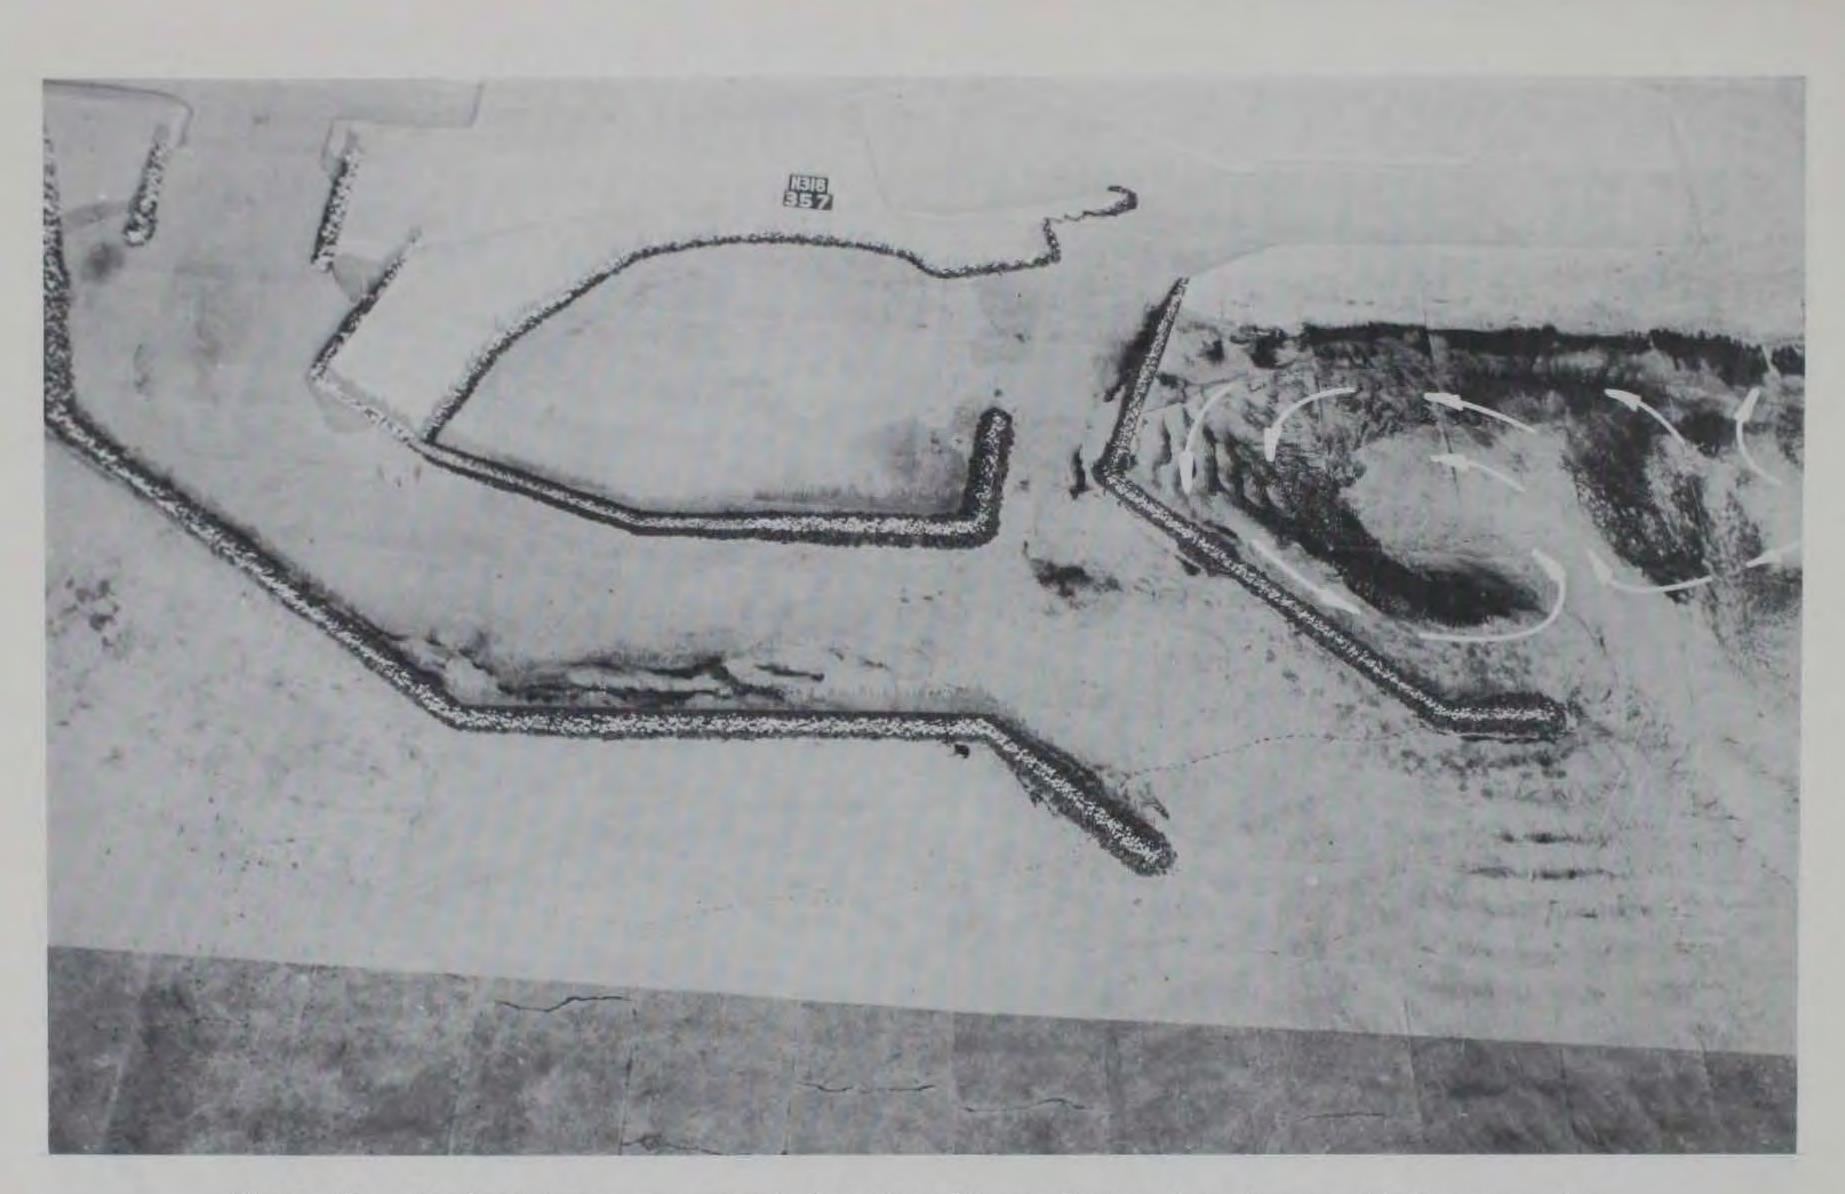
Typical tracer movement for Plan 21 resulting from 9-sec, 10-ft waves from south at mhhw
